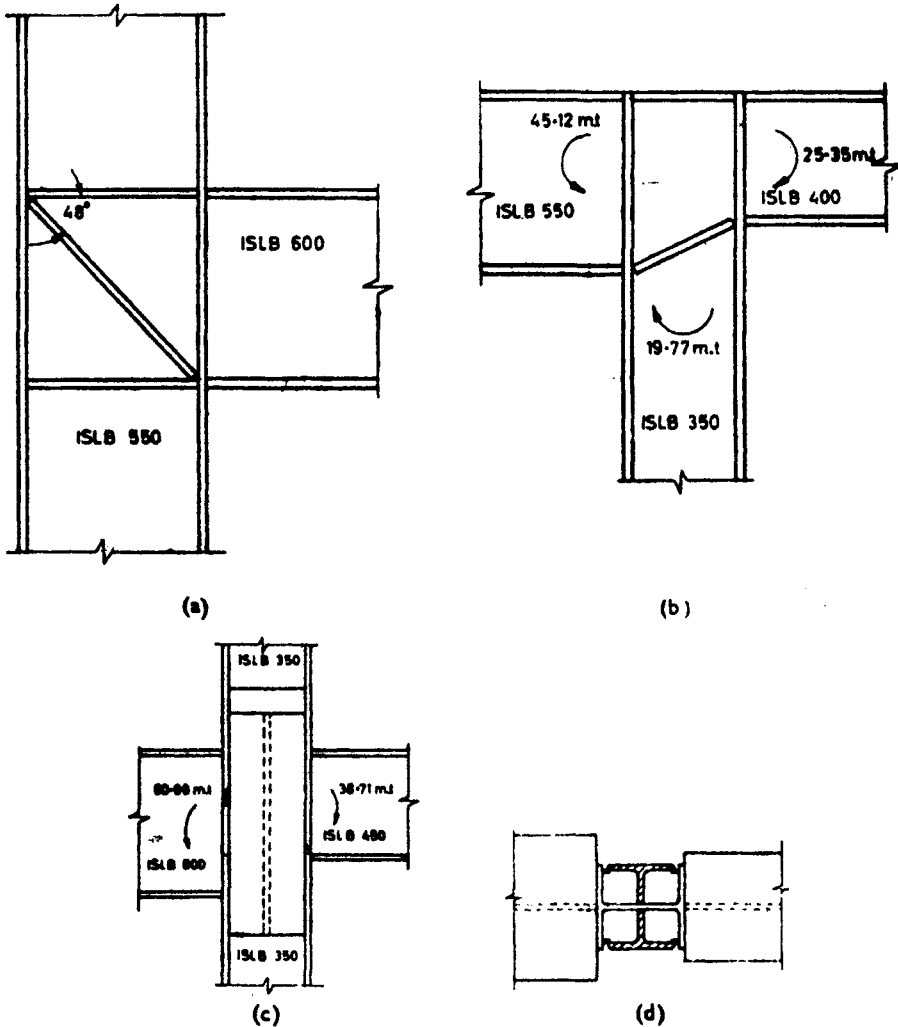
BEAM TO COLUMN CONNECTION WITH STIFFENERS — *Contd
